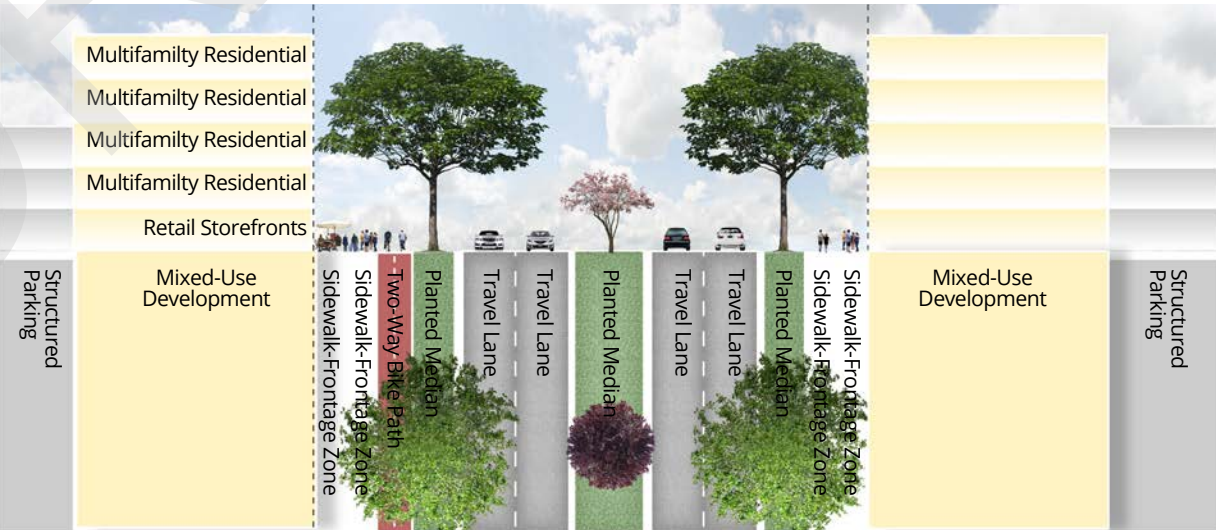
PROPOSED COUNTY ROAD 10 RENDERING
